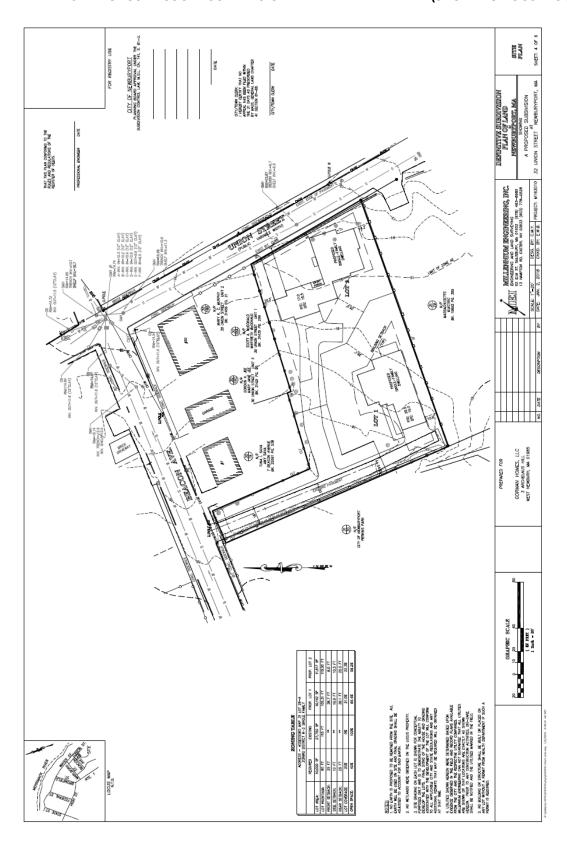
PROPOSED COURT SUBDIVISION PLAN WITH A WAIVER (SHOWING ZONING SQUARE)
